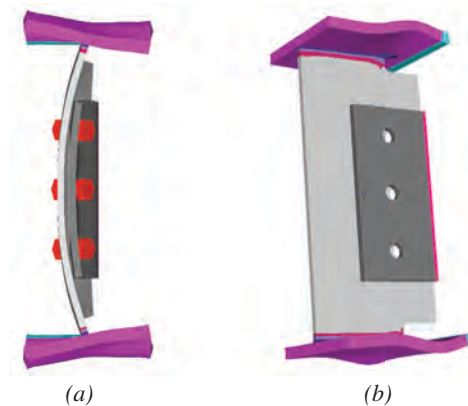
Failure modes of the WUF-B connection in compression: (a) local buckling of beam's cross-section; (b) shear fracture of bolts.
